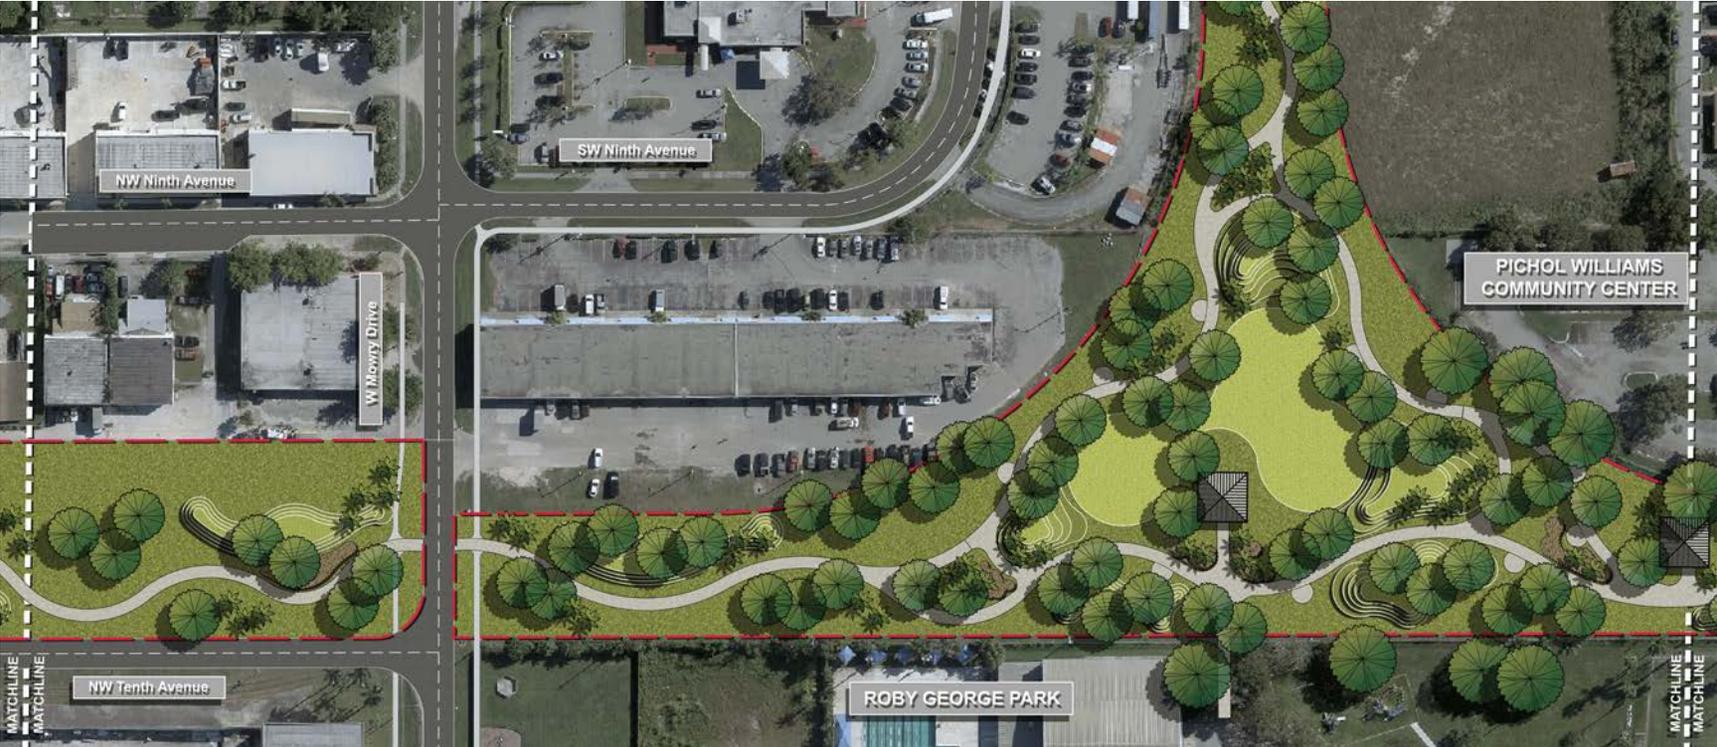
PROPOSED MASTER PLAN FOR RAILS TO TRAILS LINEAR PARK (TYPICAL I)
